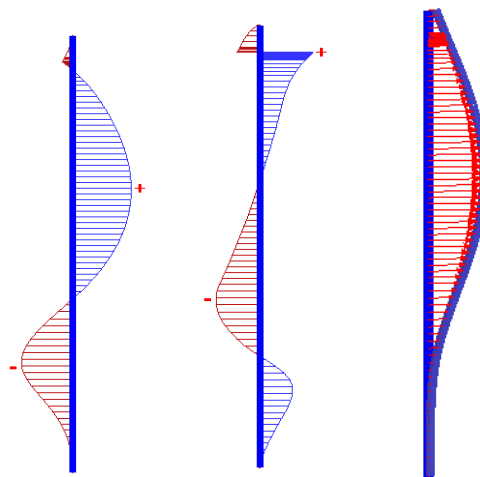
(a) Bending moment in the sheet pile (b) Shear force in the sheet pile (c) Deformation in the sheet pile, all for Sitio 1 in the operational load case where GWT = MSL
